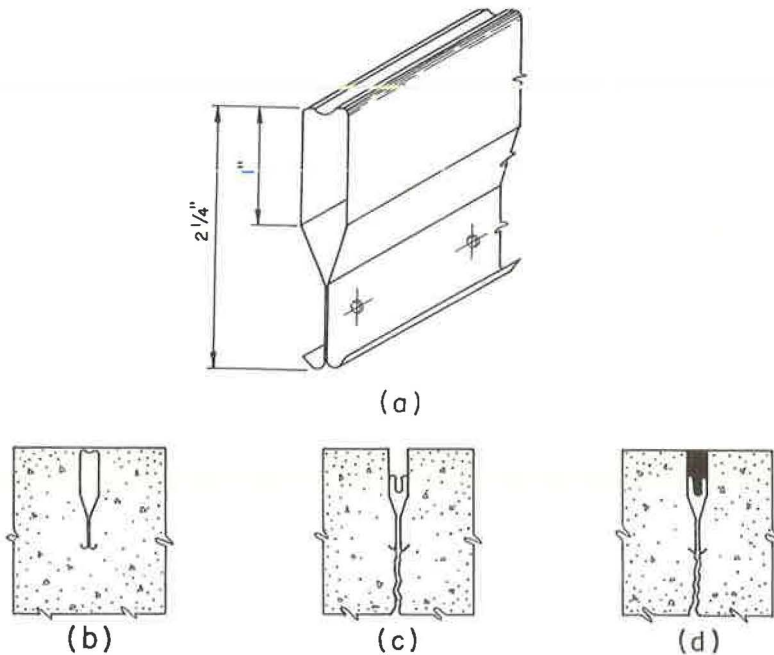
Tubular metal joint insert: (a) cross-section of $2\frac{1}{4}$ -in. insert, (b) as installed, (c) after crimping, and (d) after sealing.
